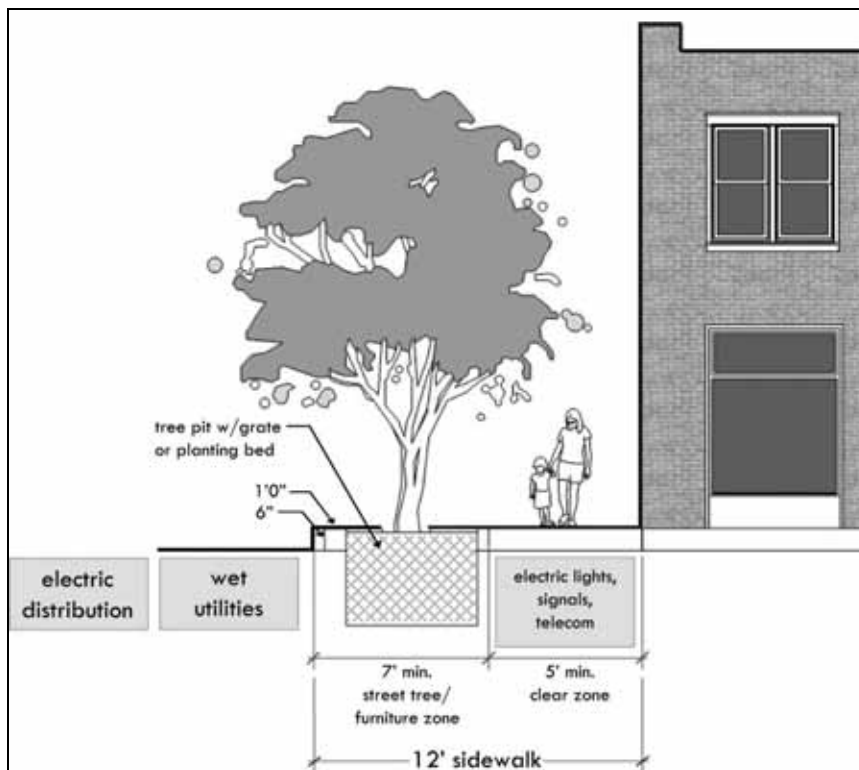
Underground Utilities on TOD Pedestrian Priority Street
